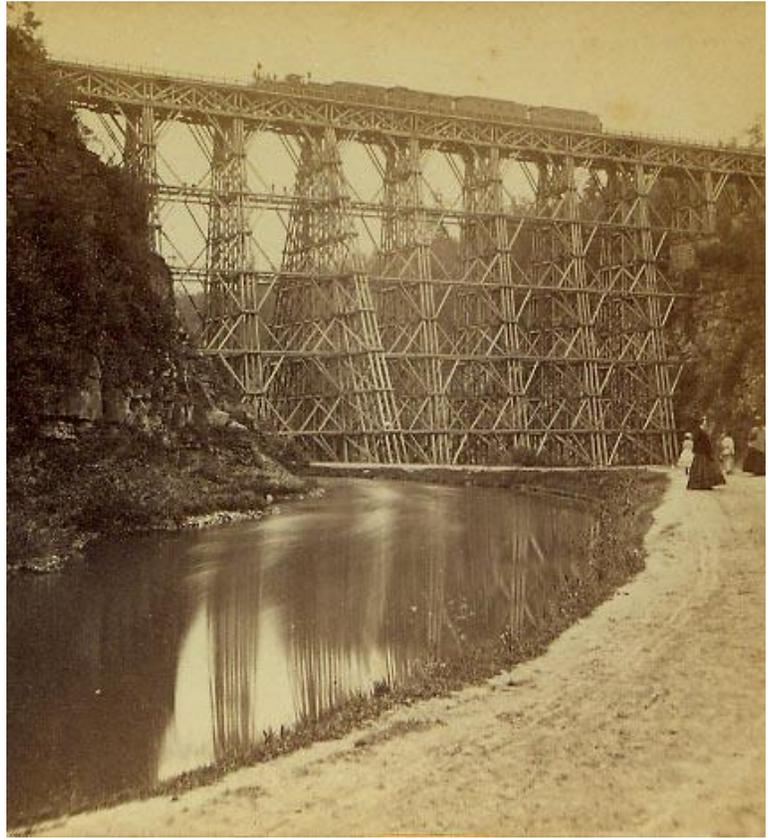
Portage R.R. Bridge, with Passenger Train, c. 1870.
